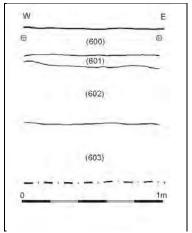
Representative section of Trench 06, showing construction layers of modern road.
